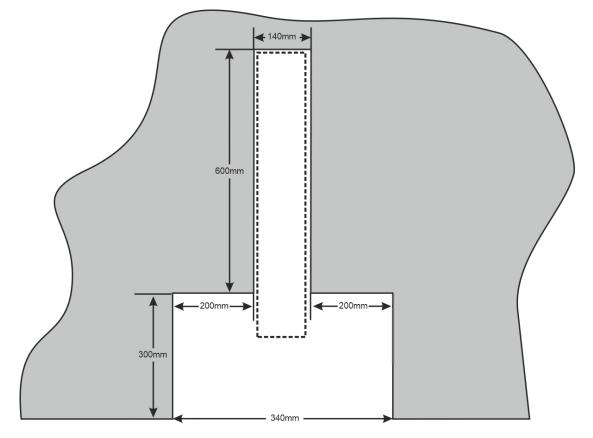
Dimensions of Niche and Hole (Top View, Rectangular Niche)
